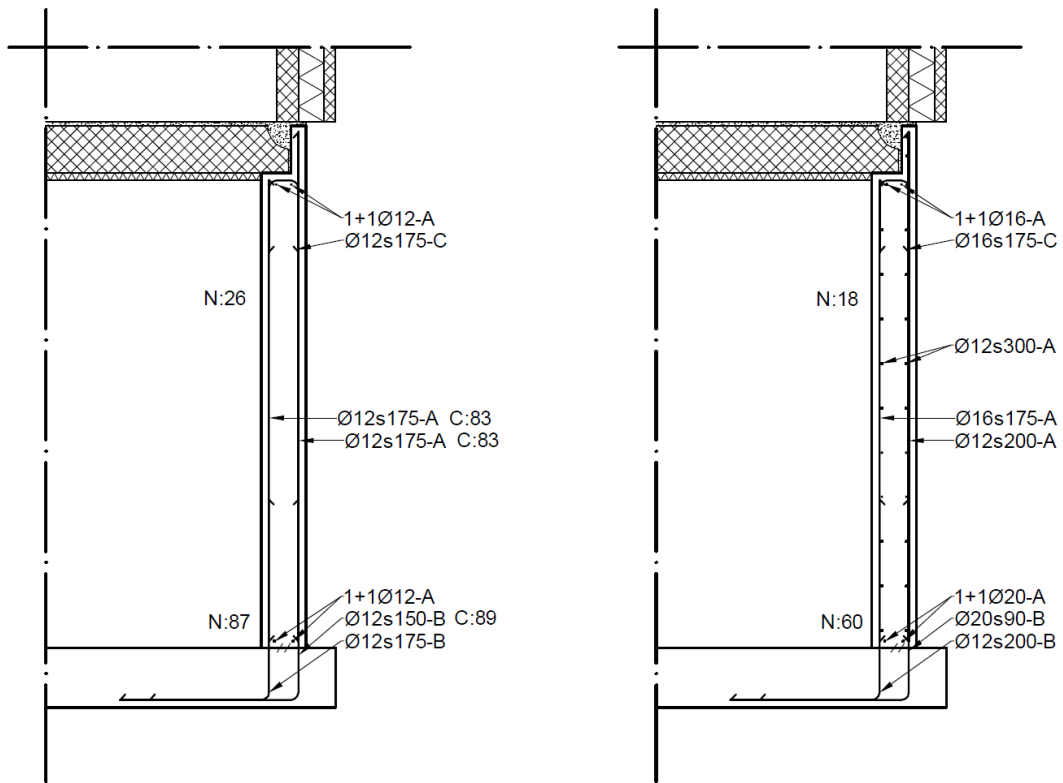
Wall reinforcement for AFRP with regard to requirements in ULS (left) and SLS (right)
